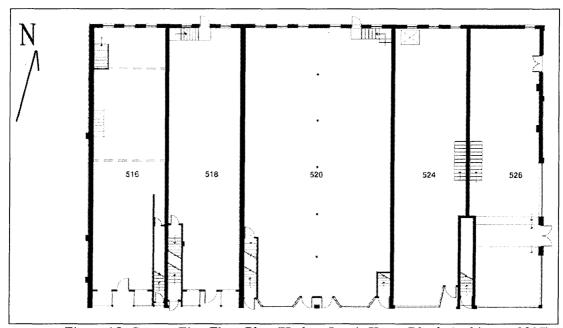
Current First Floor Plan (Herbert Lewis Kruse Blunk Architects, 2007)
